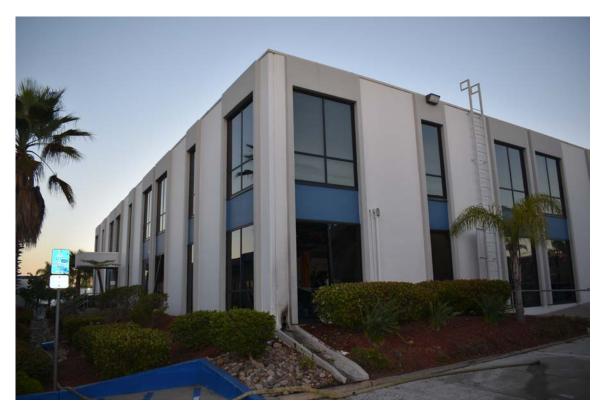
Bravo – Charlie corner. Smoke damage from bottom drains.
